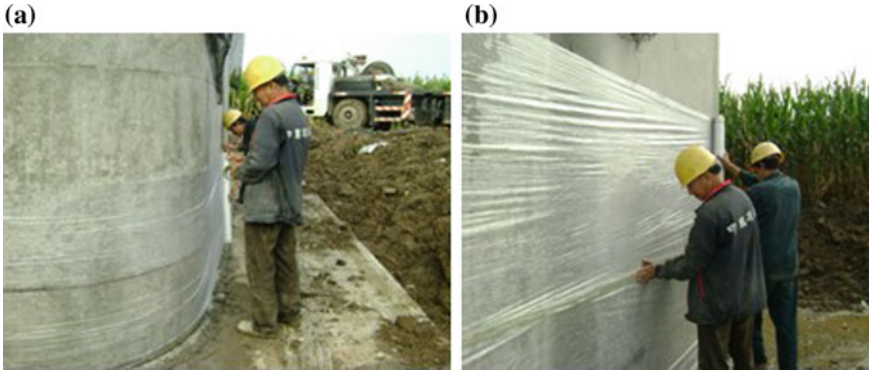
Construction of curing concrete pillar with the new-type curing membranes
